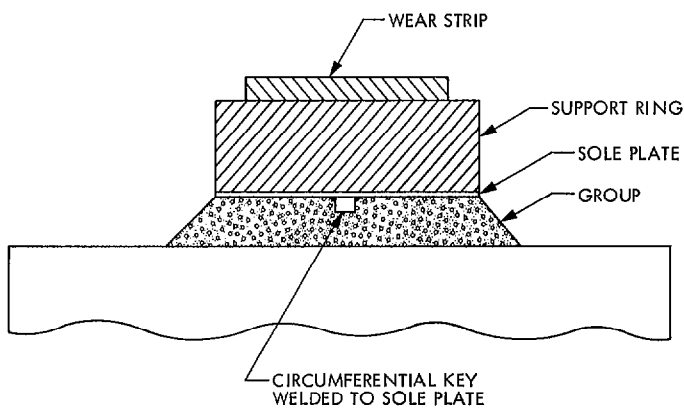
Cross section of track showing addition of sole plate keyed to grout, method 2
